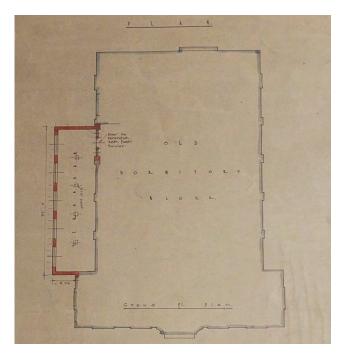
Ground floor plan for 'Proposed New Verandah to Old Dormitory Block', prepared by Joseland & Gilling, architects, and signed by contractor J. Harper on 25 October 1928. (Source: Barker College Archives, Plan M0006).
